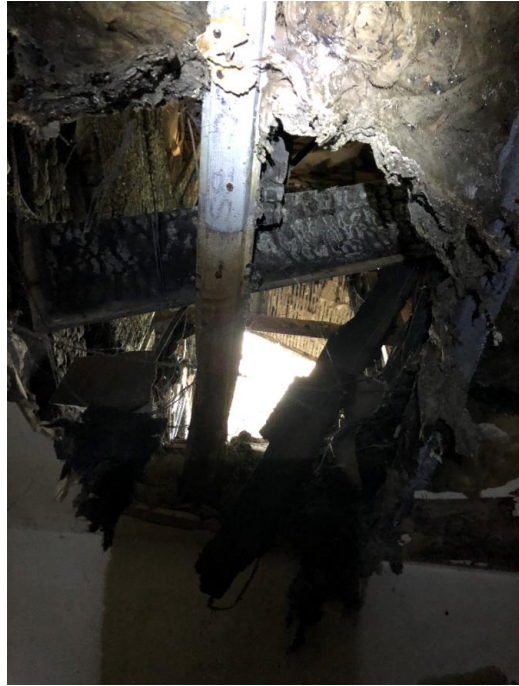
Apartment 1 fire damage to stair above kitchen
